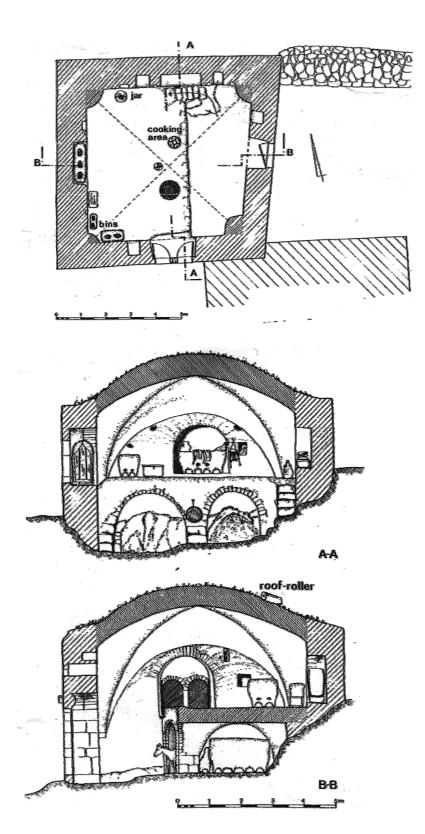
Plan and sections typical old Palestinian private open space in Al-Jaba'a village. Source: Hirschfeld, 1995.
